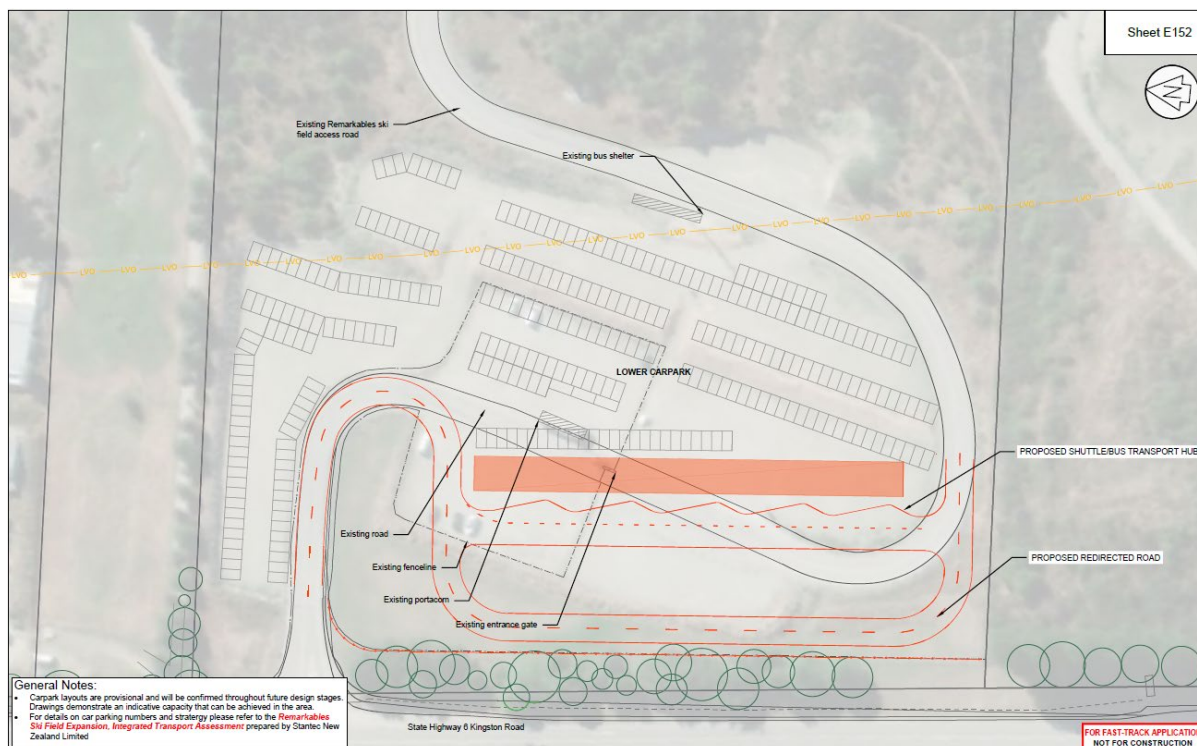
Bus platform schematic design layout (Source: Southern Land Drawings Sheet E152)
